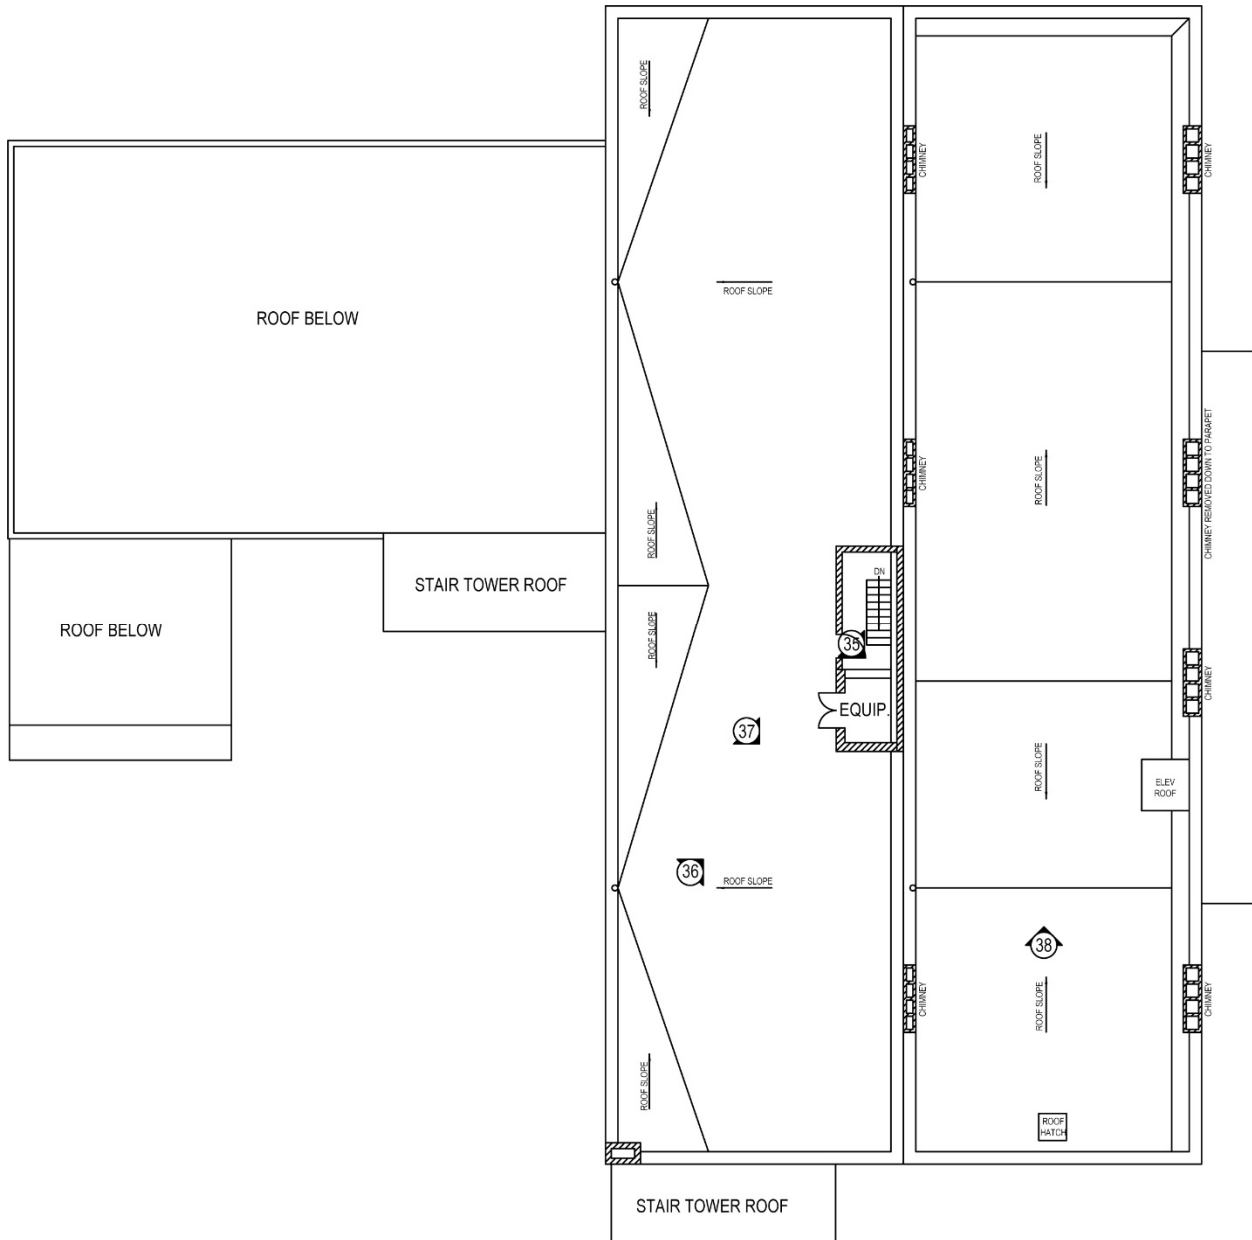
Roof Plan with Photo Locations (not to scale) ↑
